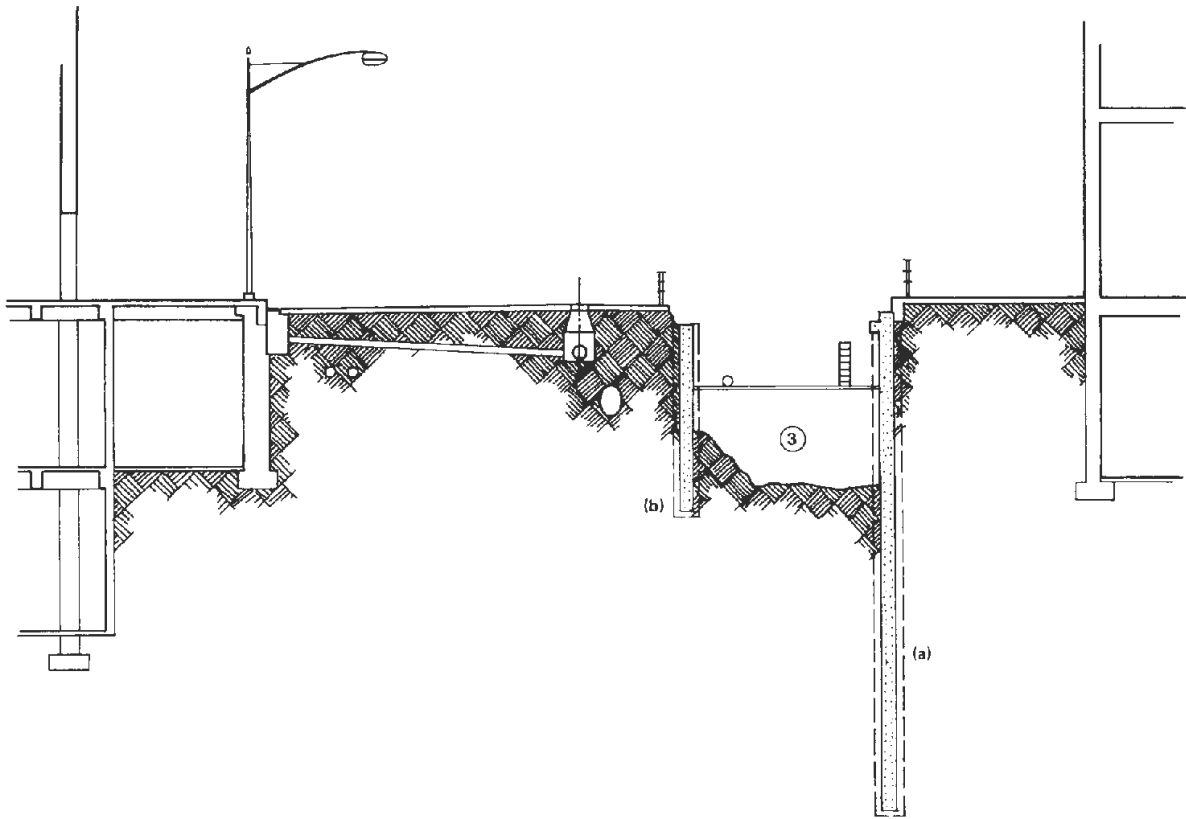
Step 5: Construct guide walls for slurry trench (a).
